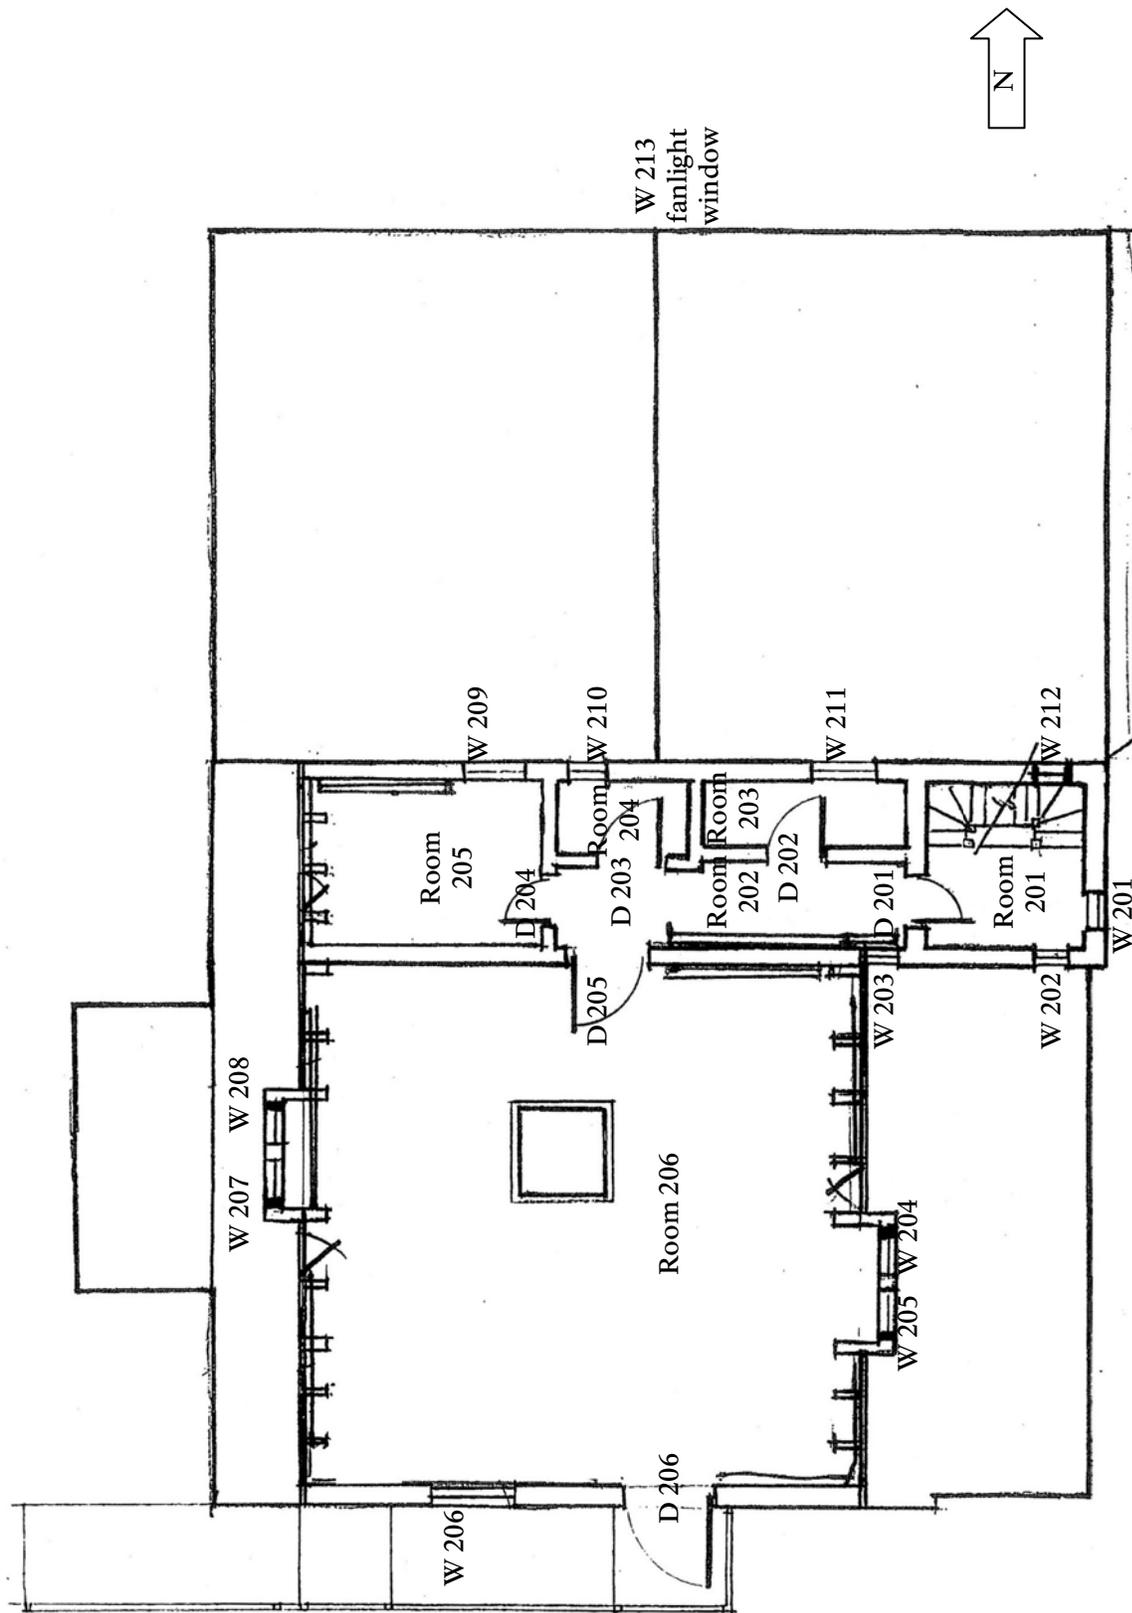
1894 Spermaceti Cove Life-Saving Station, second story plan with room, doorway, and window opening numbers.
